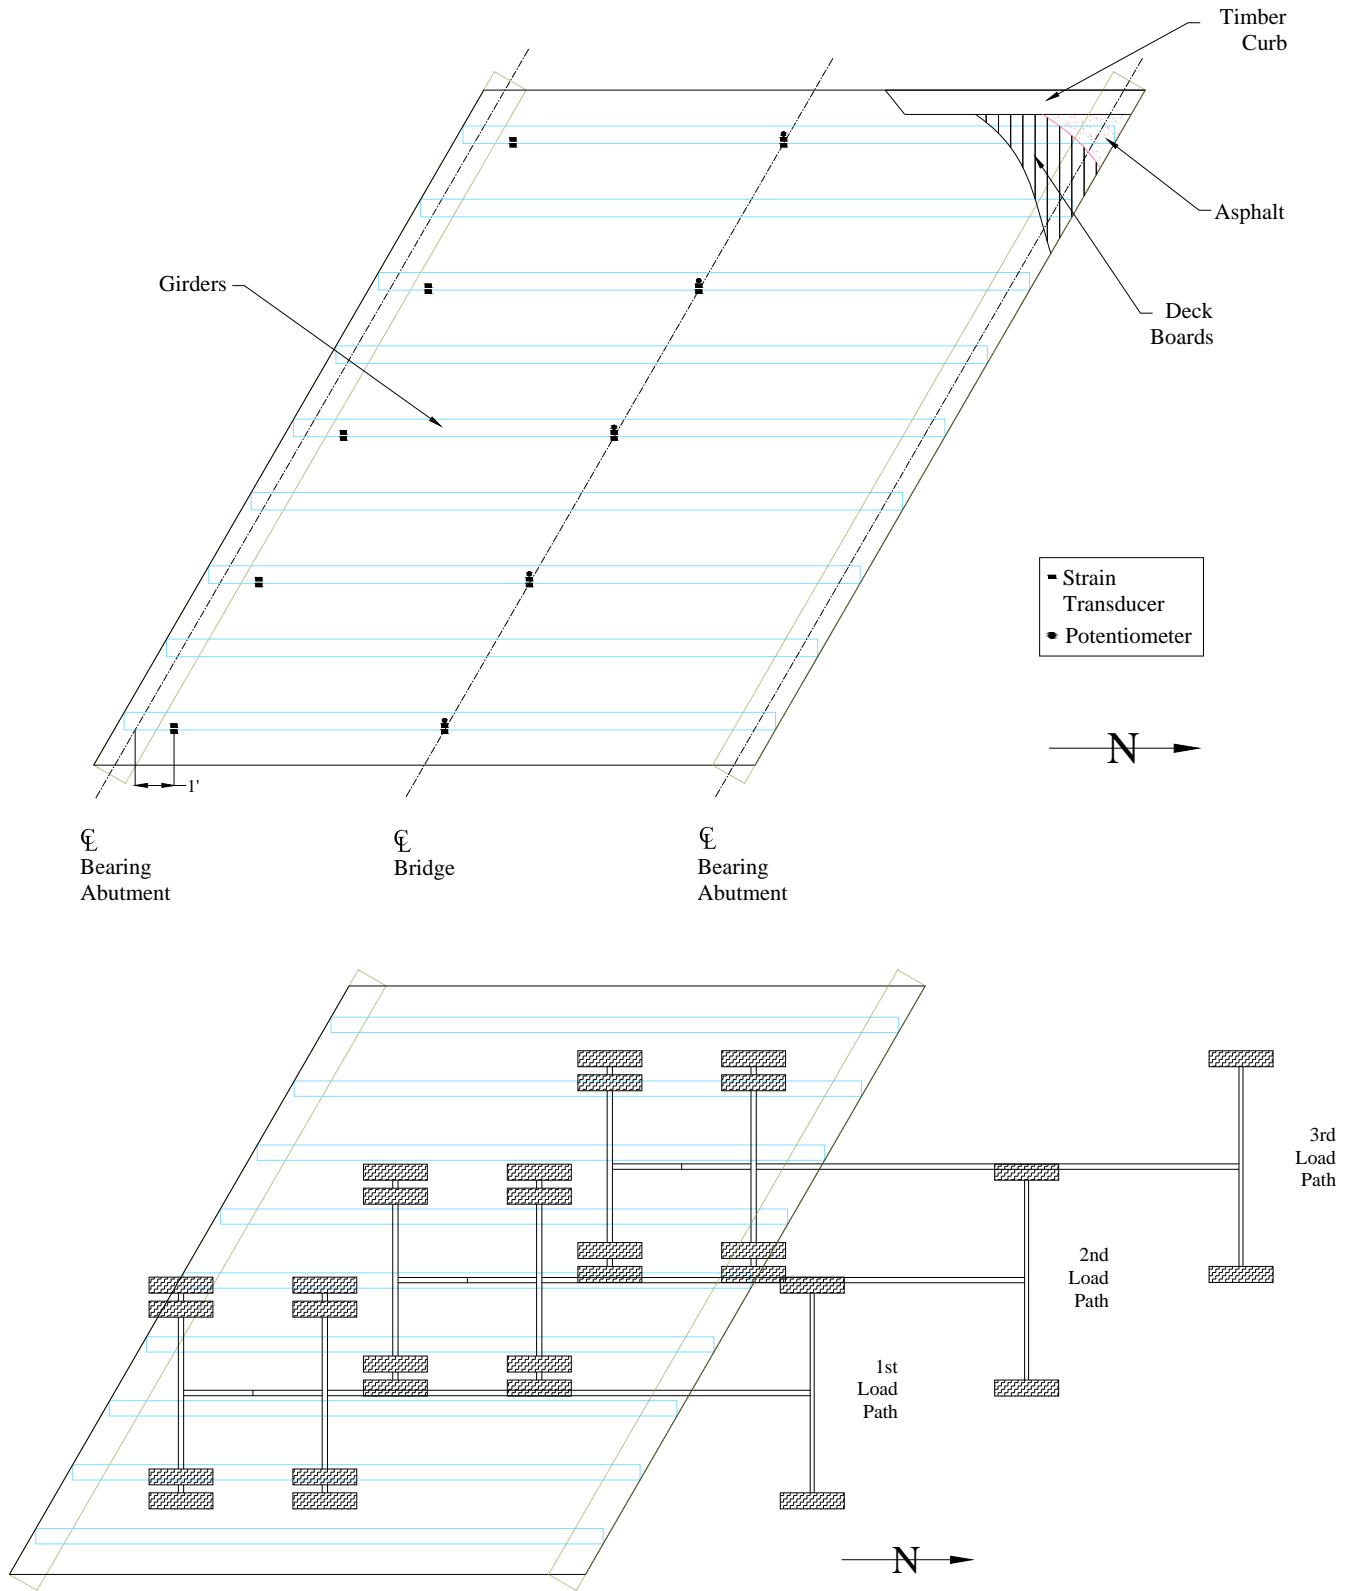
Instrumentation and Load Paths of Madison County Bridge
